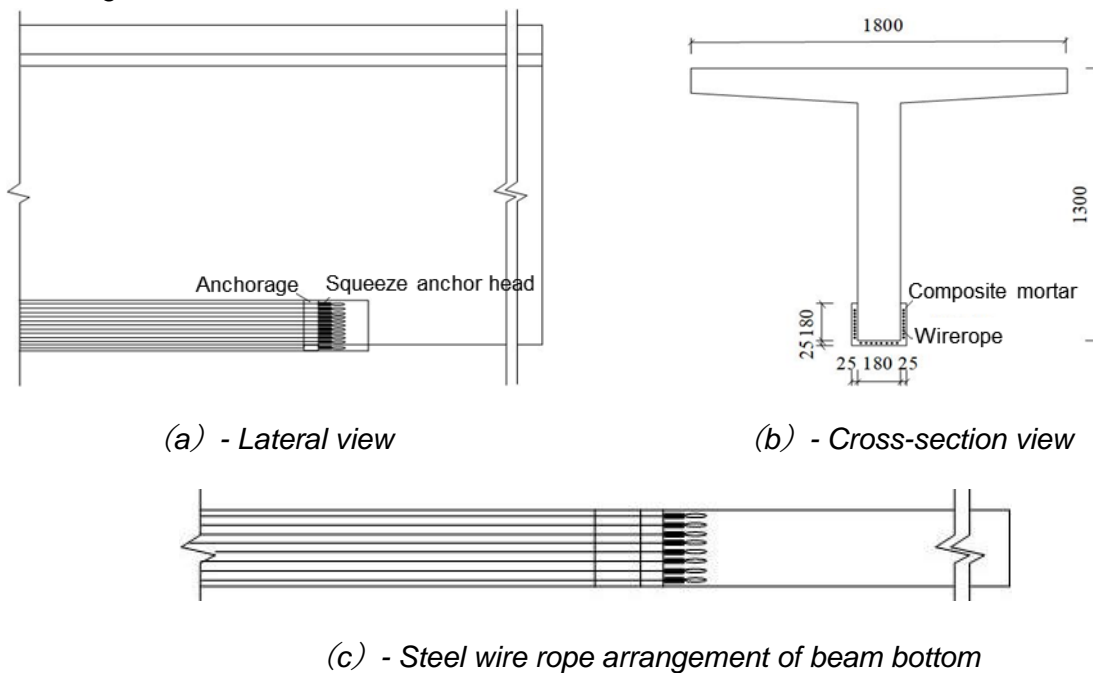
Lateral view, cross-section view and steel wire rope arrangement view of bridge two (Unit:mm)
